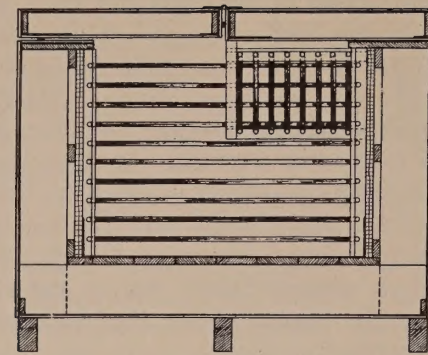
End section-view of Fig. 5 showing location of refrigeration coils of the type shown in Fig. 8.
